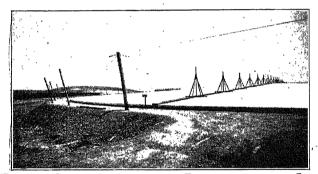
Construction on the Embankment of a Large Reservoir Showing the Peripheral Cable, Grid and, in the Background, a Steel Tower
